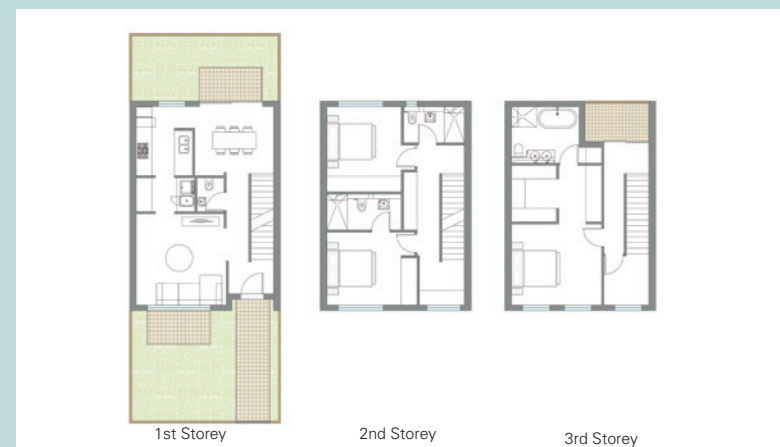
Potential Double Loaded Townhouse Apartment Layout
